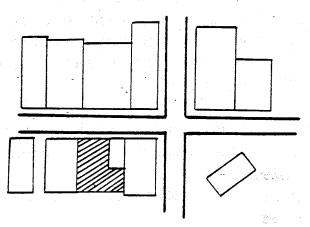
Developed site, an addition to an existing building. Existing building is used in determining primary design of the addition.
